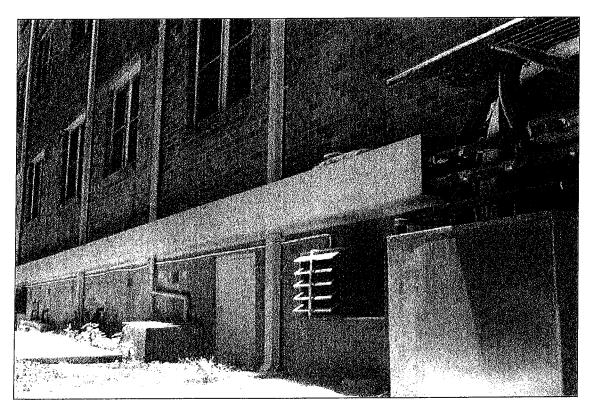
Suspected Zelminite Backing Board at Rear of Building
